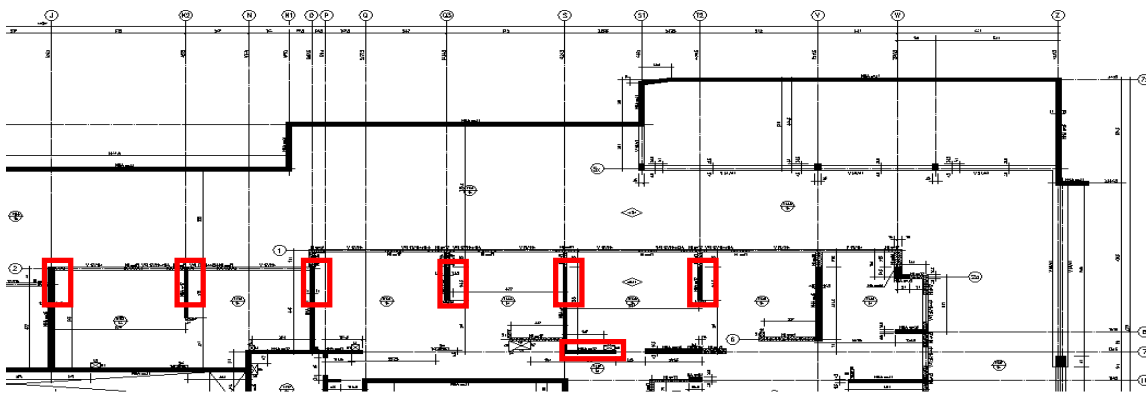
Building #2 – Damaged walls in the first subterranean level.
